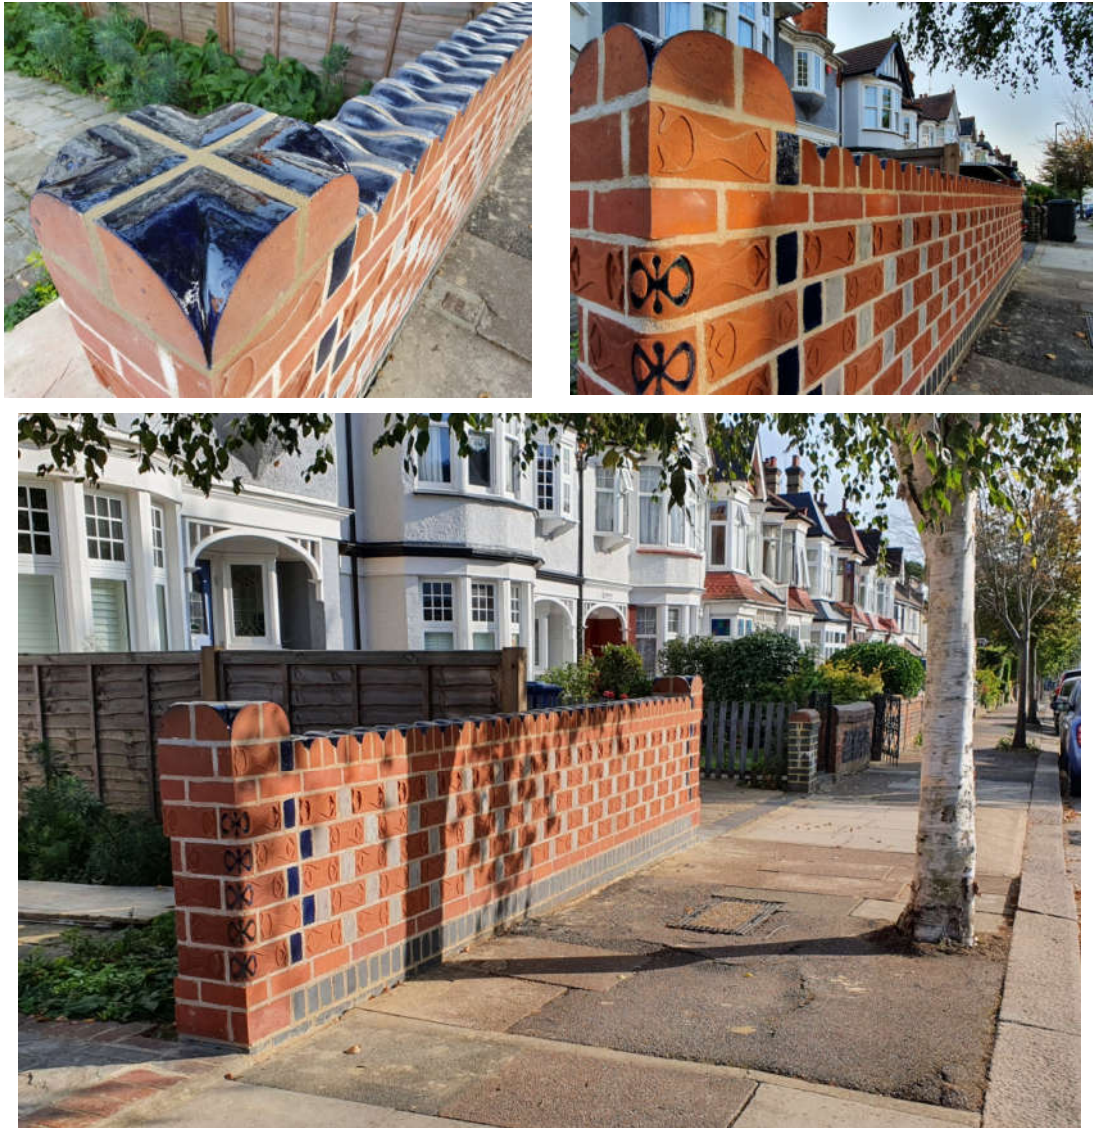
Completed Ornamental Wall. Clockwise from top left: glazed pier caps installed; Wall integrated into the streetscape (2020)
